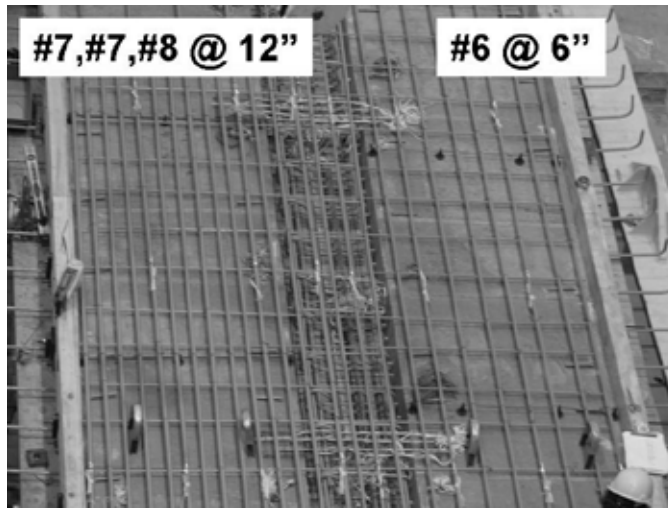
Longitudinal deck reinforcement in laboratory specimen
